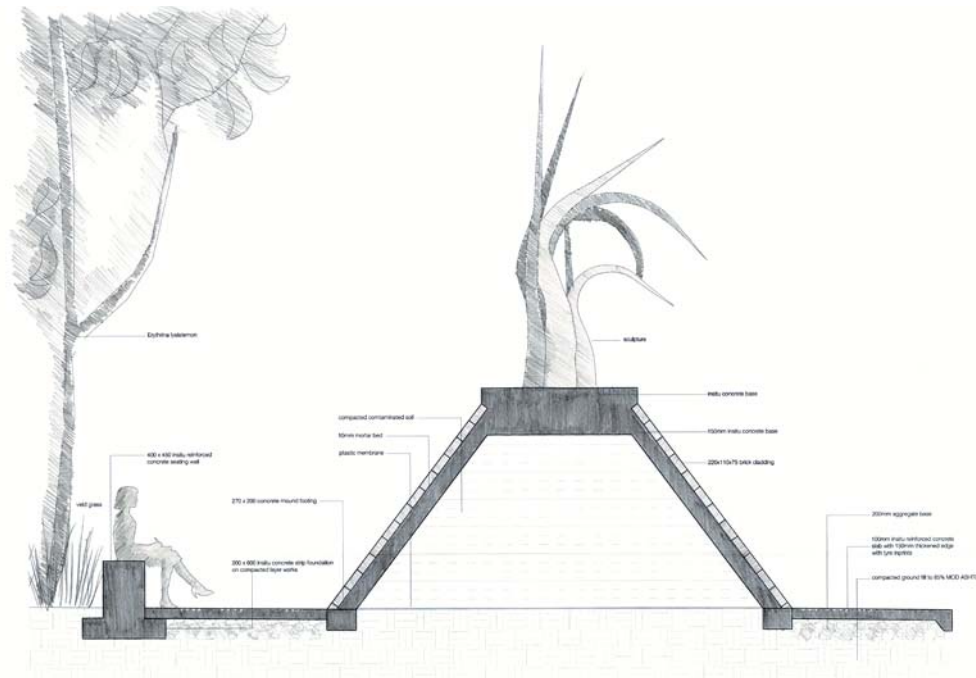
Sculptural capped mound. Detail B. Not to scale
